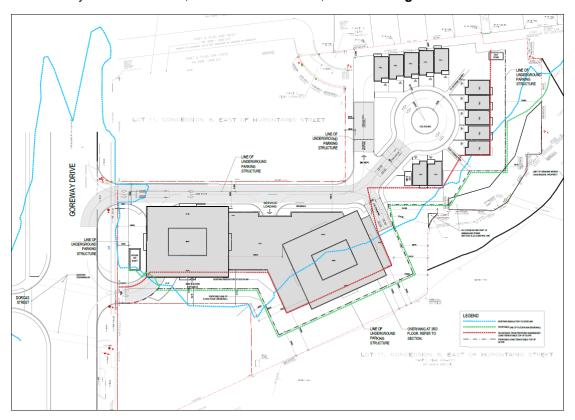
Proposed Development Concept Site Plan, Prepared by IBI Group
